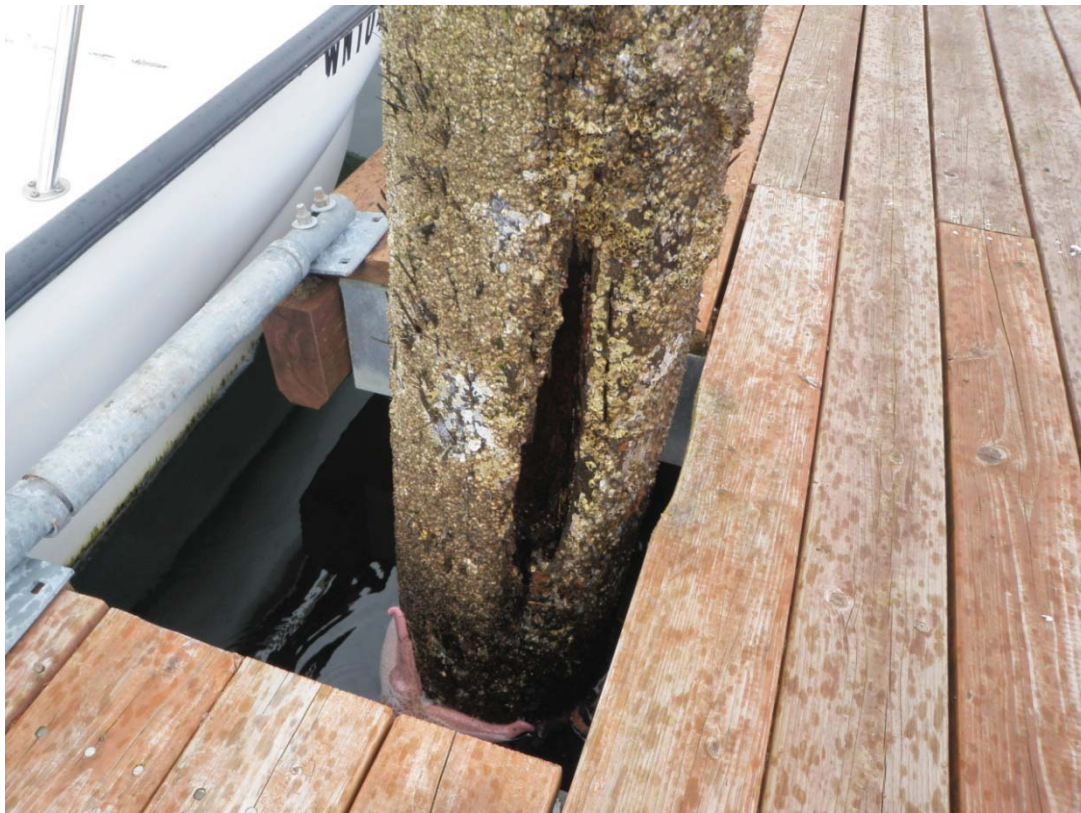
North Beach Marina Boat Dock example of deteriorated Pile
